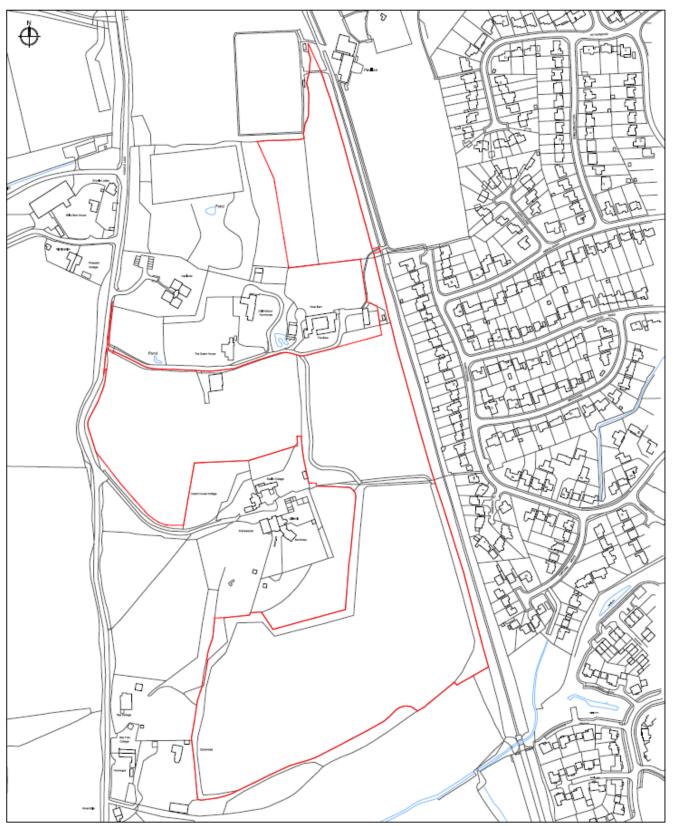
Site Location Plan (Richards Urban Design Ltd)
